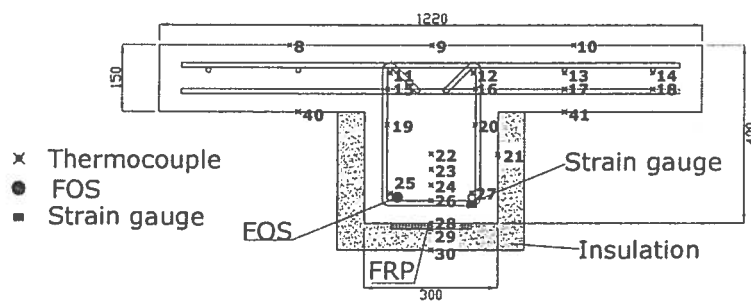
Details of reinforcement and instrumentation for beams (dimensions in mm).
